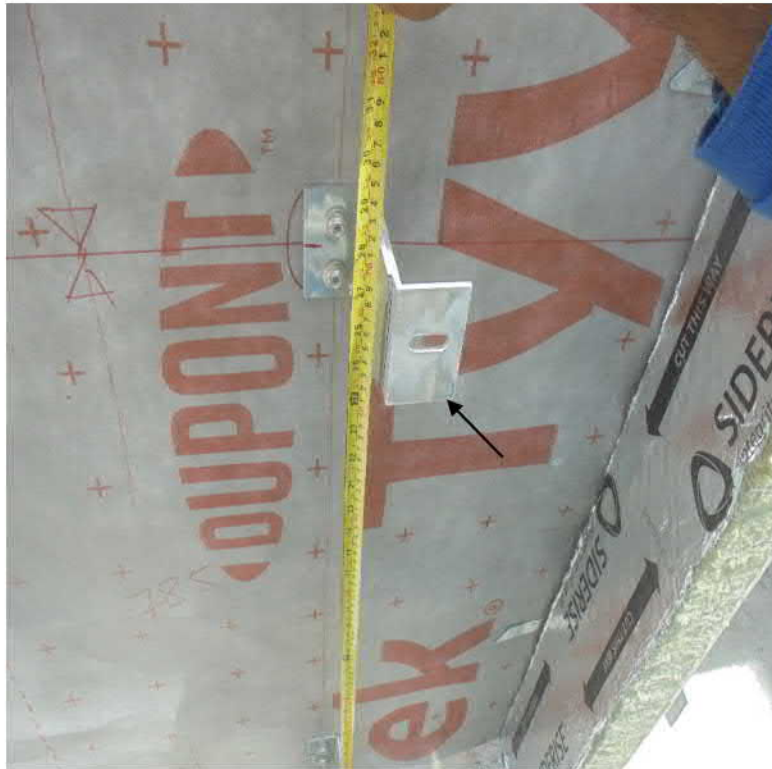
Alubond RFS aluminium horizontal support bracket fixed to the GI wall bracket
